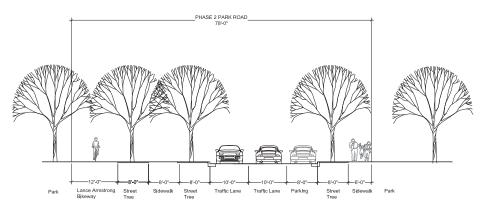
South Park Road / Cesar Chavez Street Road Diet Section
